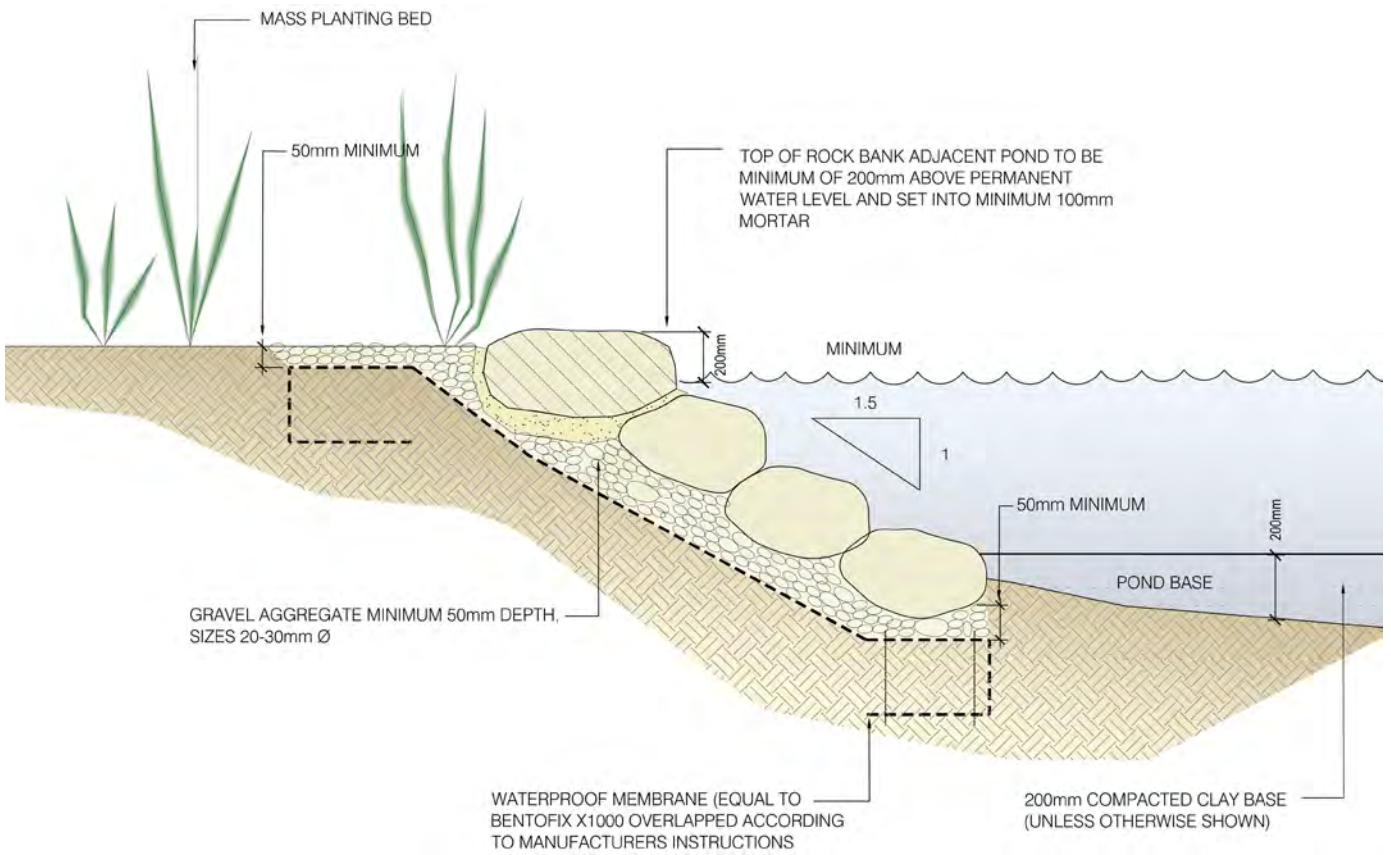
Typical rock bank- similar to treatment proposed under the bridge for the abutment
